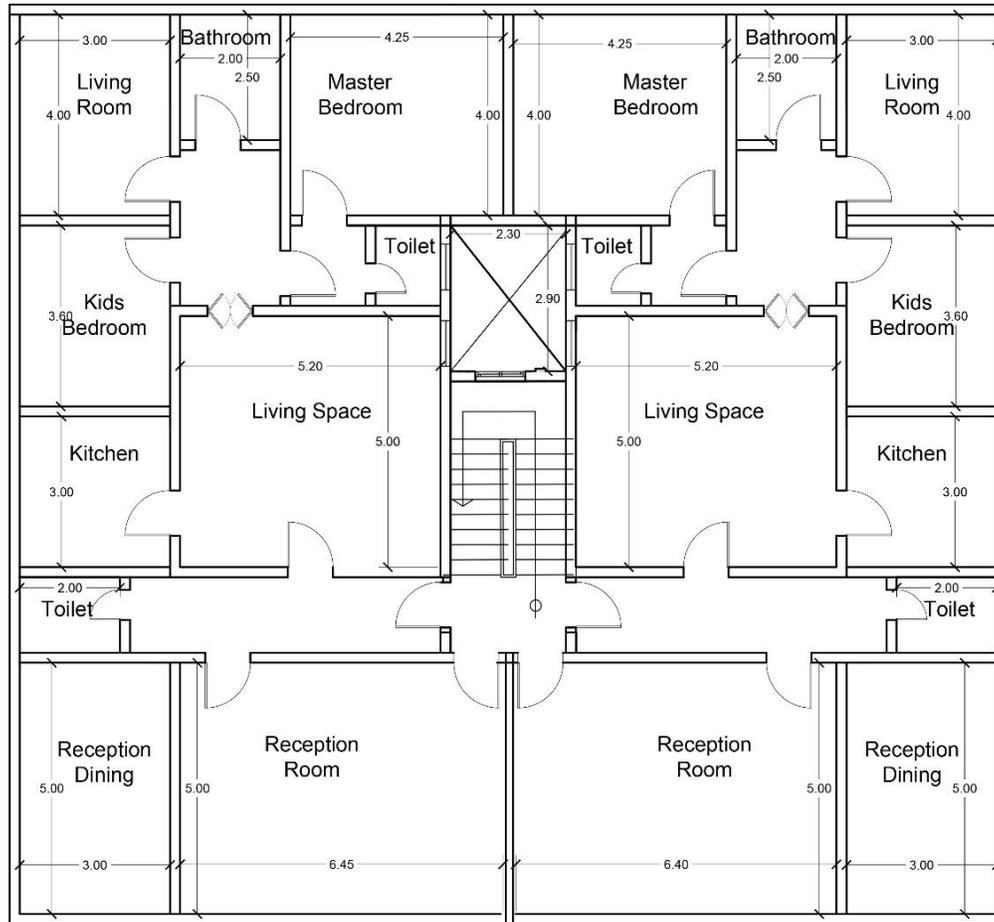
Floor plan of Contemporary block of flats (category 1)
